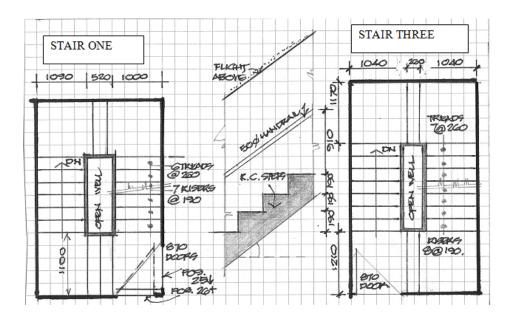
Detailed Plans Stairs 1 and 3 – Building M6 – See Part Section
